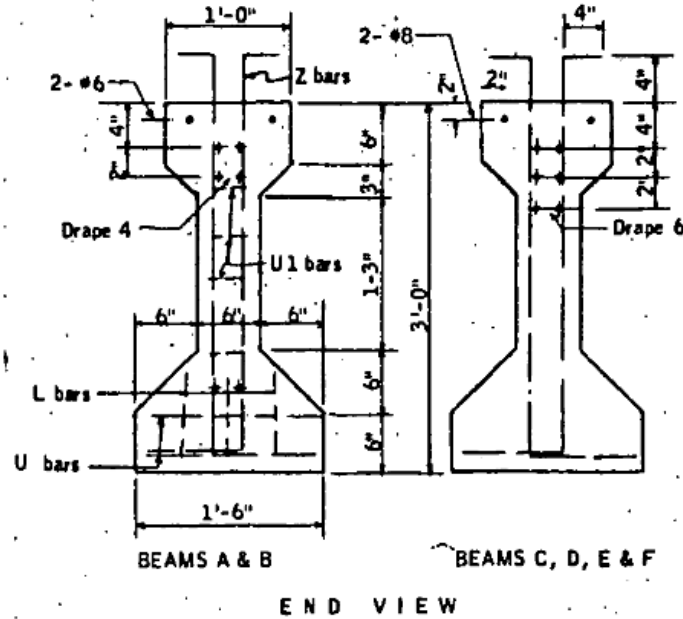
End cross-section view of Beam "A" and Beam "C"
